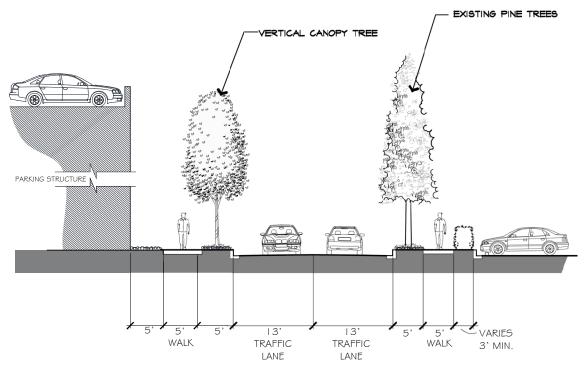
Ontario Center Parkway Roundabout Public Streetscape Section and Plan
